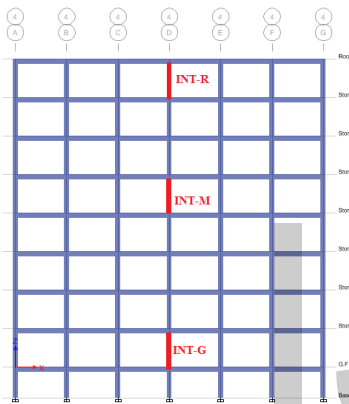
a, b, c ARE COLUMN REMOVAL LOCATIONS OF TYPICAL 3 m SPAN BUILDING
